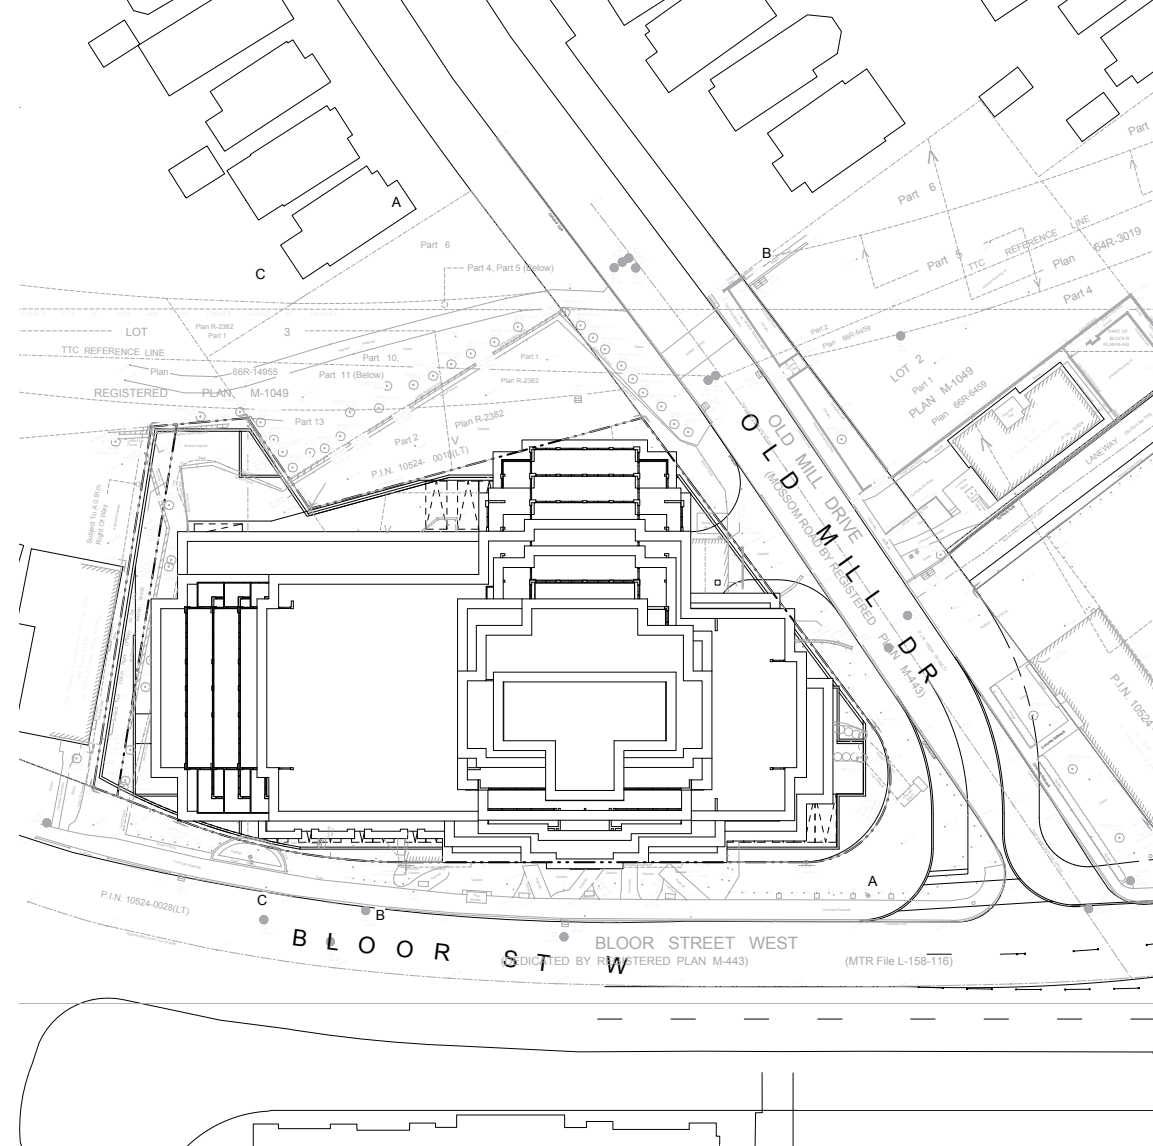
Proposed development at 2500 Bloor Street West (Building A), Site Plan
